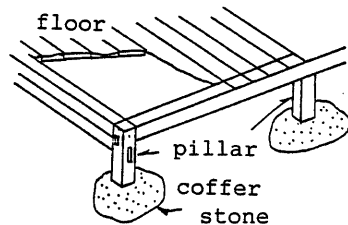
Example of base structure of old-fashioned Japanese-style wooden house
